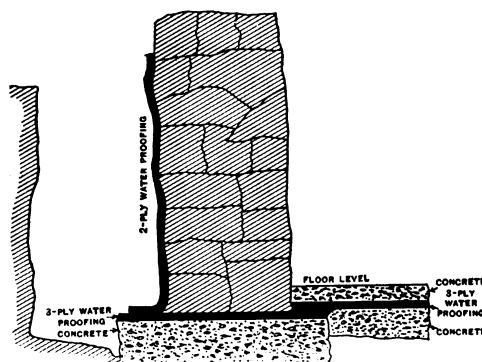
Damp Proofing in Connection with Stone Walls.
